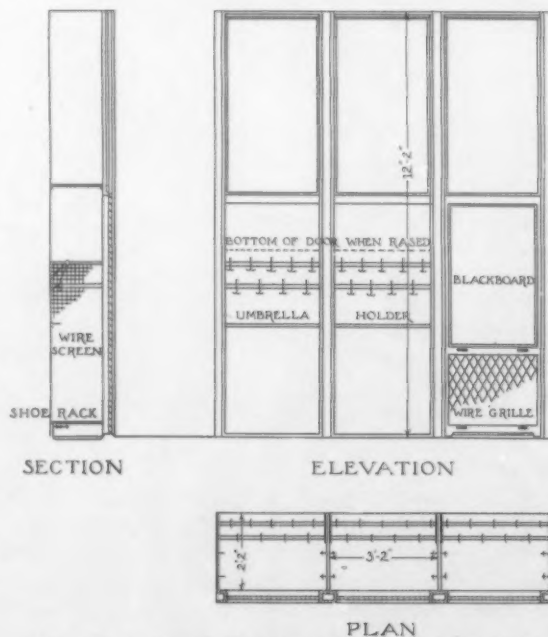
Details of Class Room Wardrobes in Ventilating Stacks
